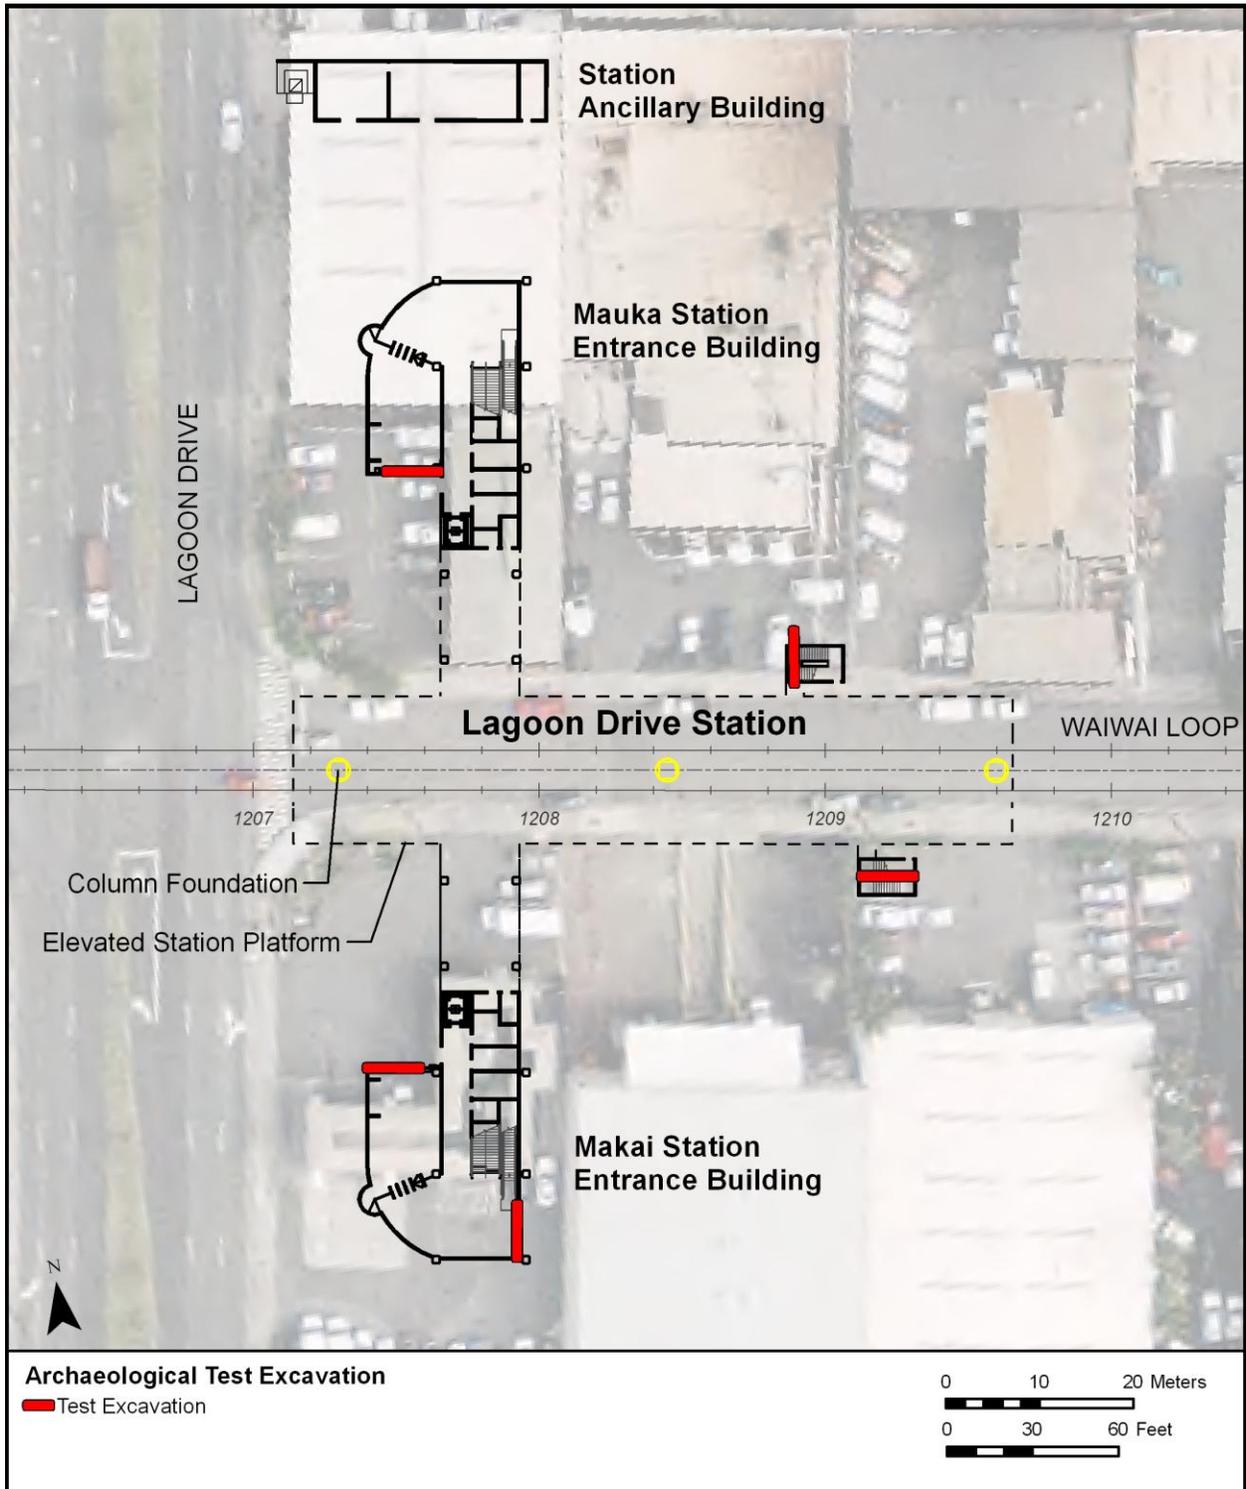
Lagoon Drive Station, 5 20x2 test trenches (2 at Mauka Station Entrance Building, one at mauka access and 2 at Makai Station Entrance Building)
